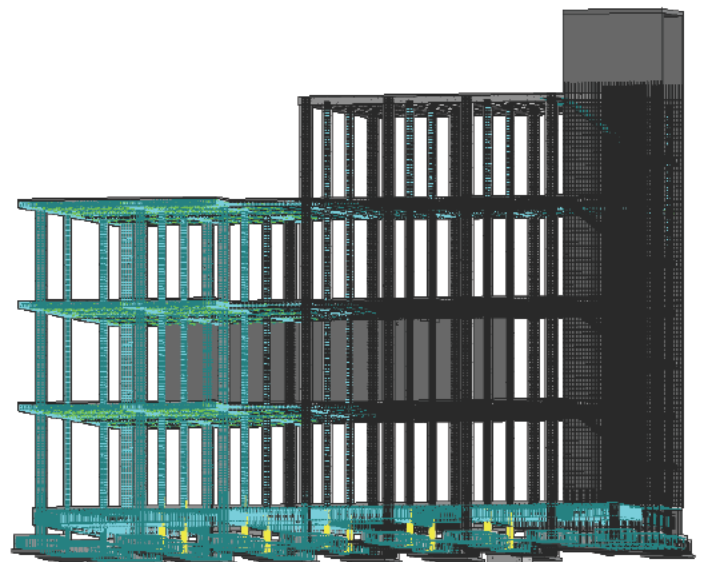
Reinforcement of Udey Building modelled on Revit
